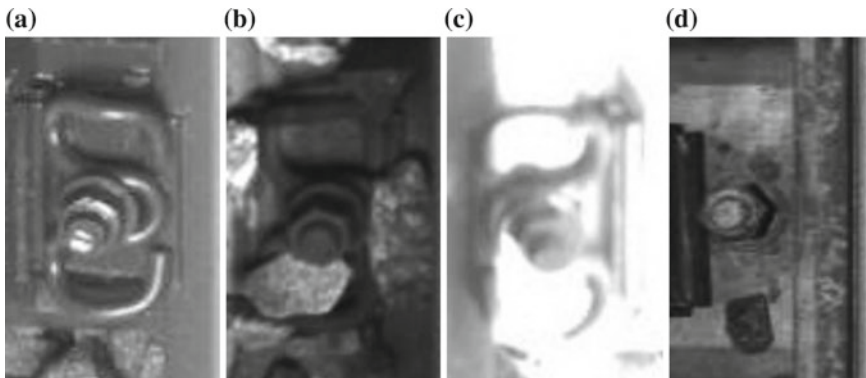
Typical defect patterns in several fastener subgraphs: a normal fasteners, b ballast cover, c uneven lighting, d damaged fasteners
